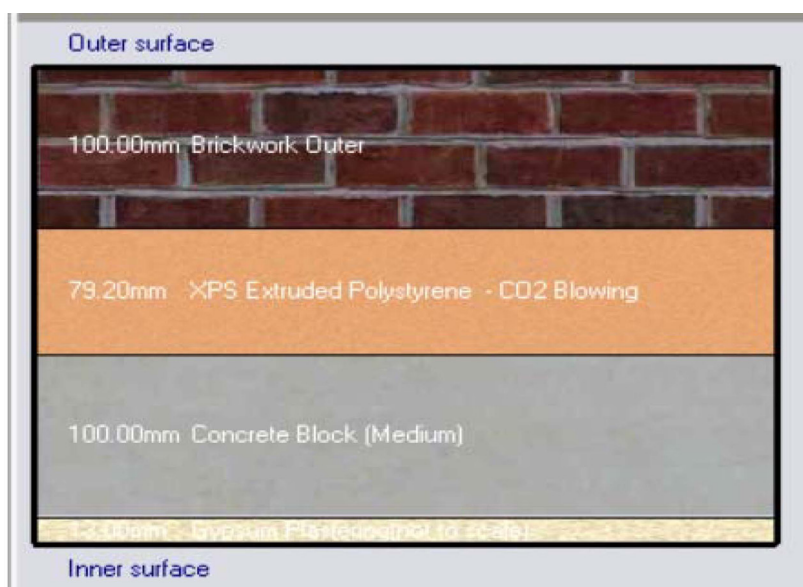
Different layers of exterior walls (3 inches of added polystyrene insulation).
